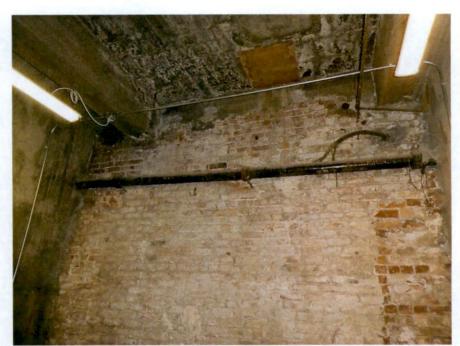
Photo DD: View of concrete wall and ceiling at basement level in area that extends underneath city sidewalk.
